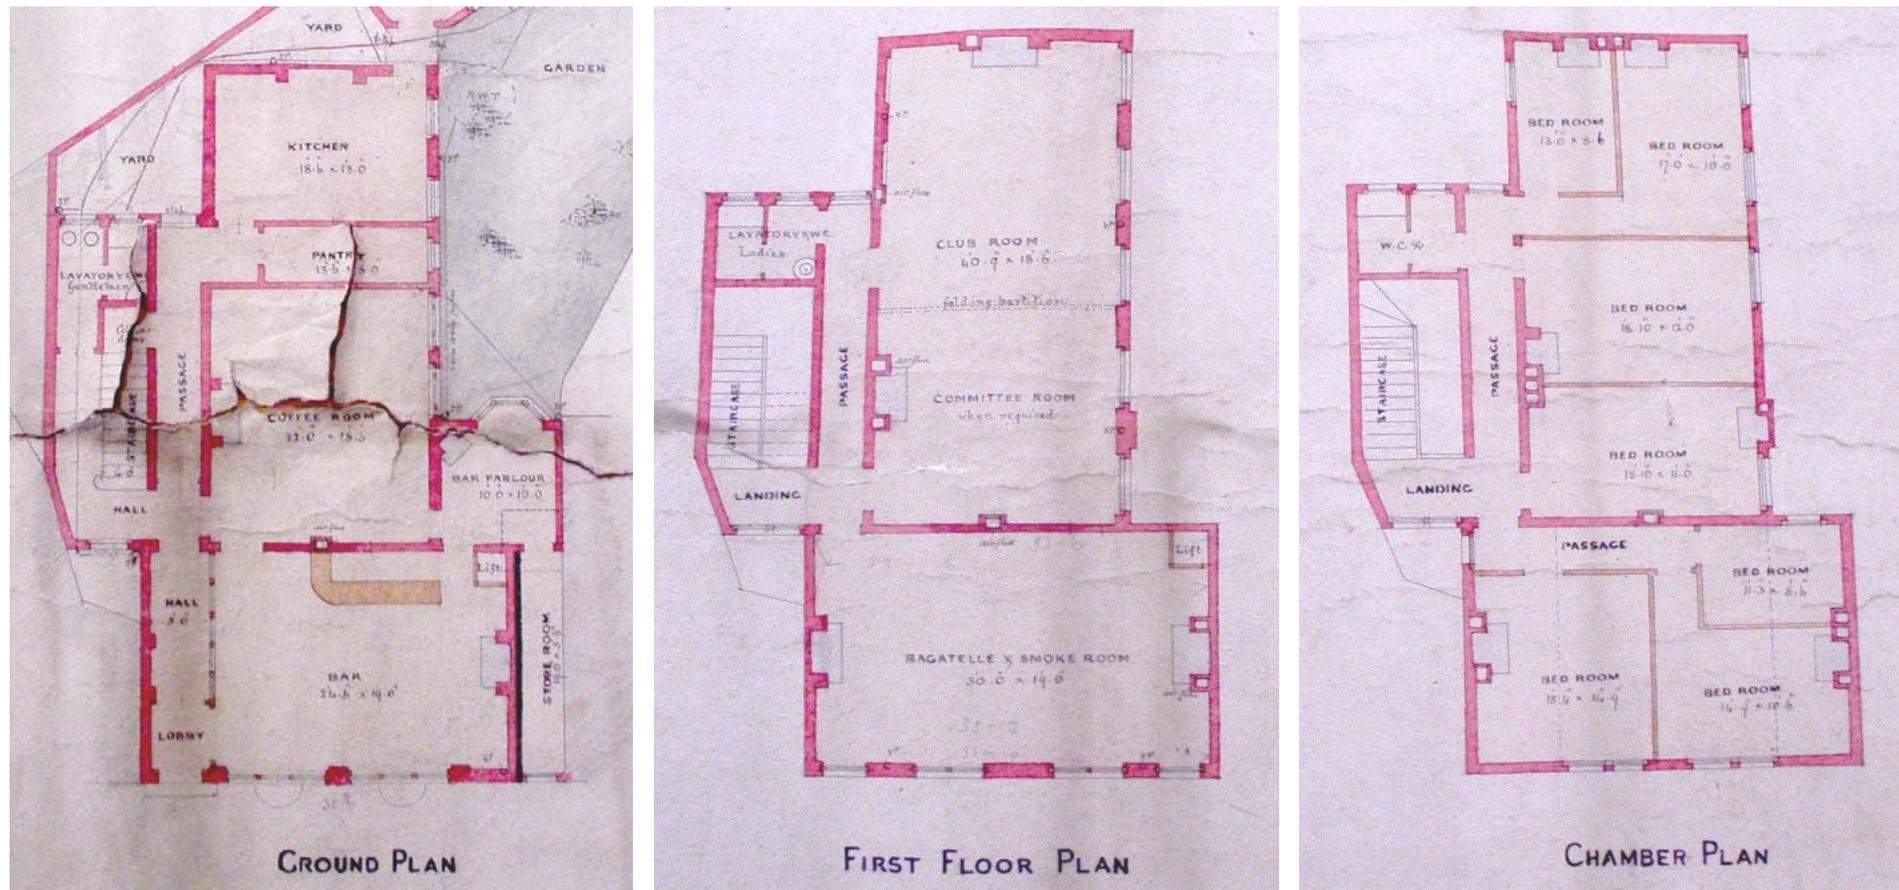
16 Old Square (former Coffee Tavern) - architect's drawings c.1880, floor plans (WRO CR 592 Box 10)
